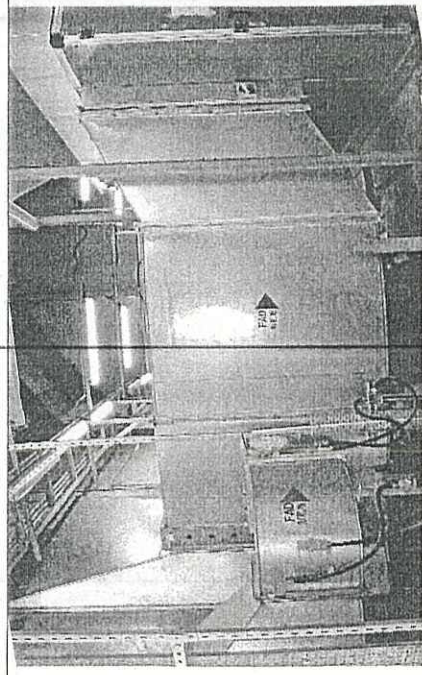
Silencers installed within the ducting of ECS at SIH
